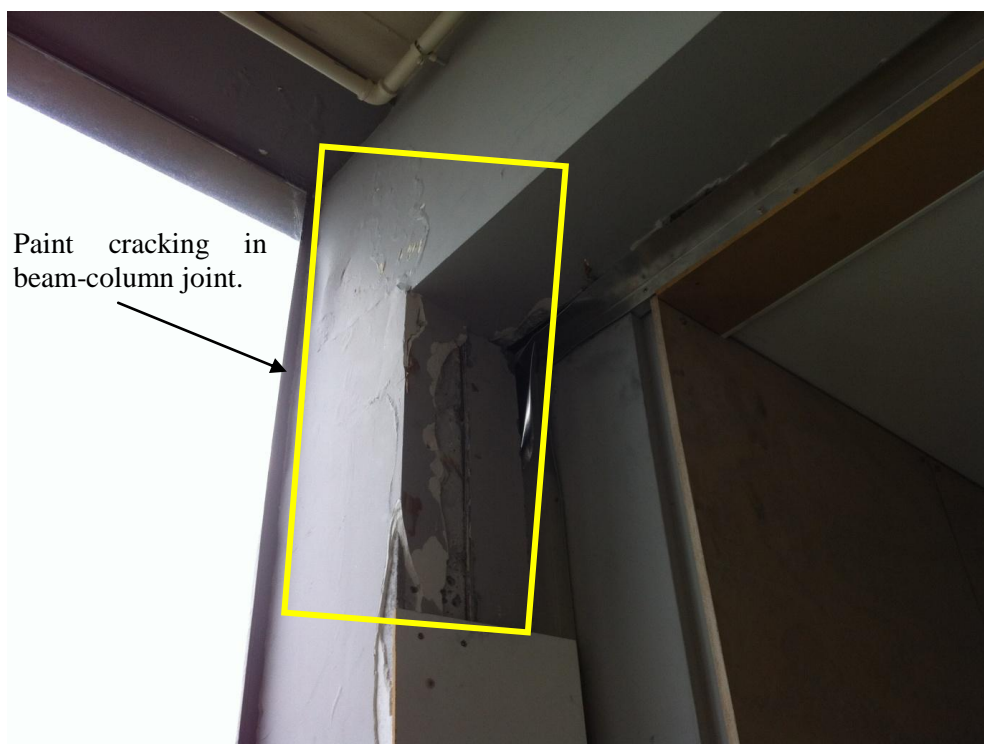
Photo of cracking in eighth floor beam-column joint which can be seen in the warping of the surface paint.
